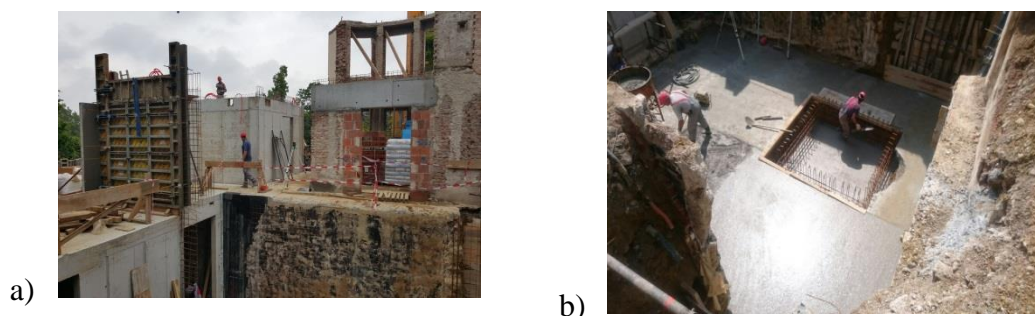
a)work in progress, new walls are being built, b) the floor concrete slab and the foundation of the elevator pit are performing
